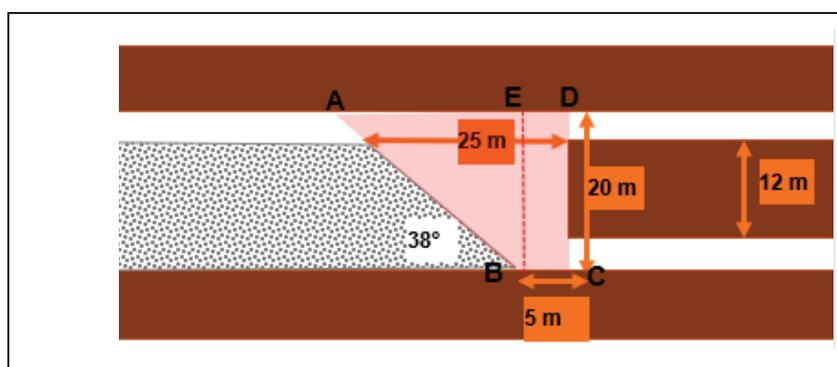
Longitudinal bench & fill mining scheme for a bench height of 12 m.
